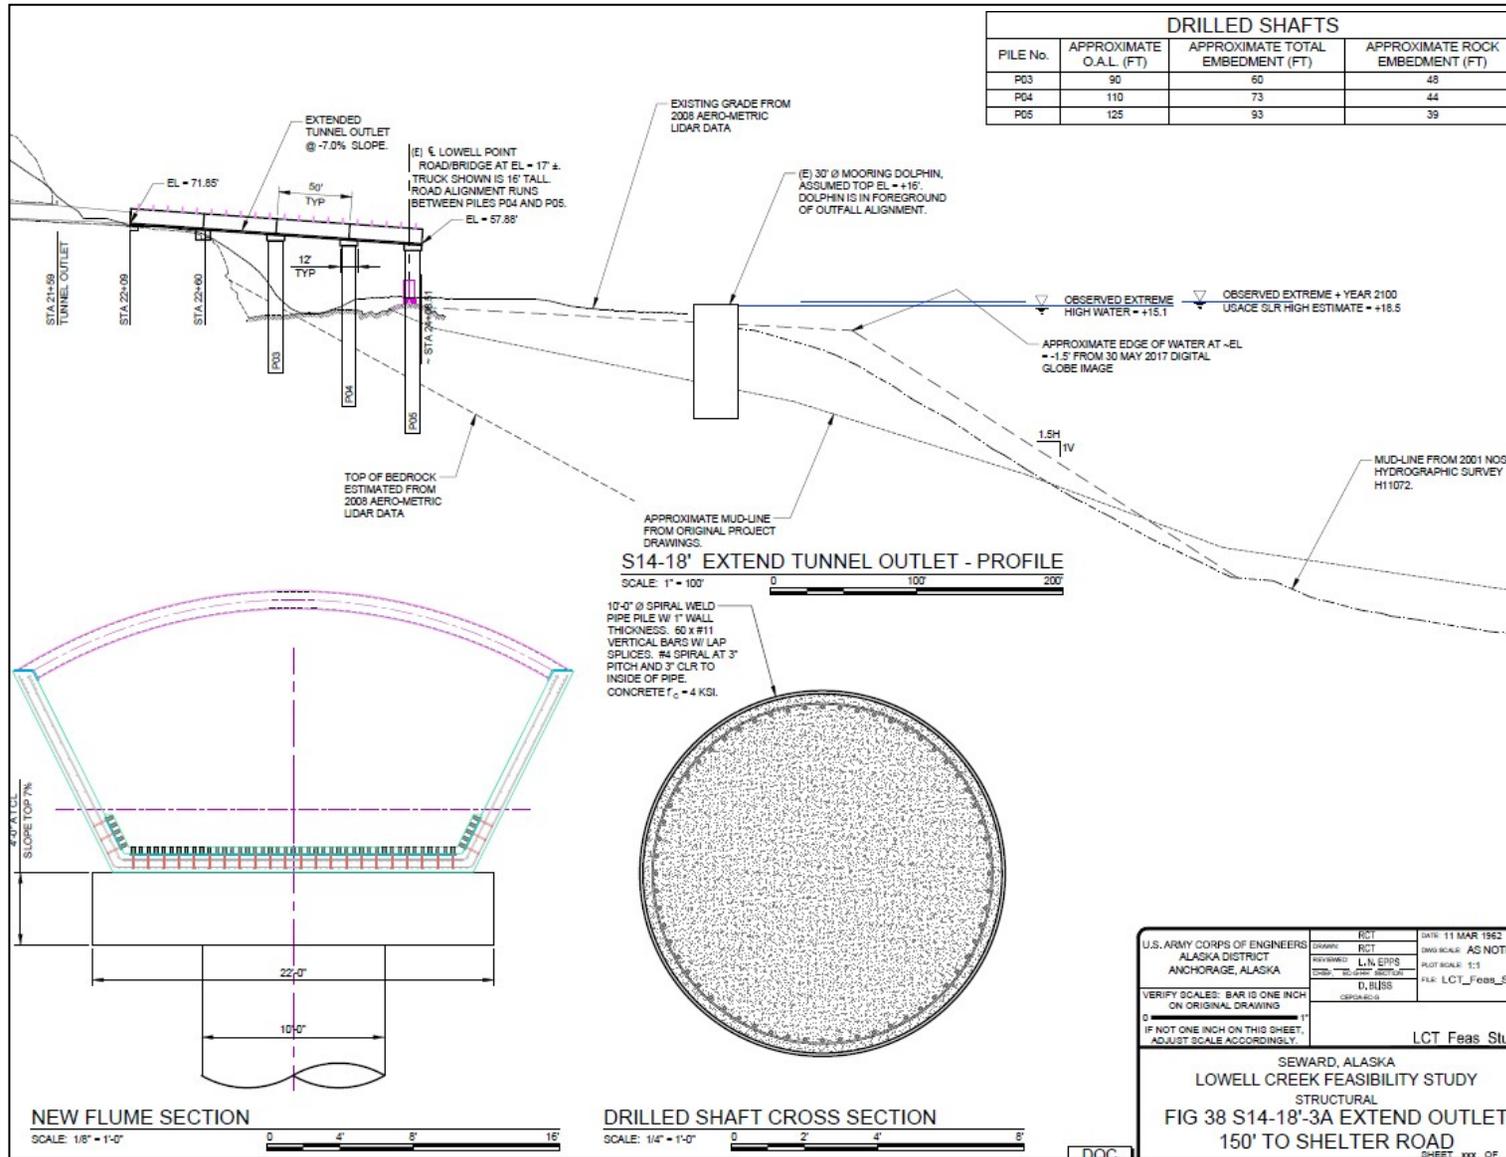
Extend Alternative 3A and 3B Tunnel Outlet 150' to Shelter Road (Alternative 3A shown, Alternative 3B similar).
